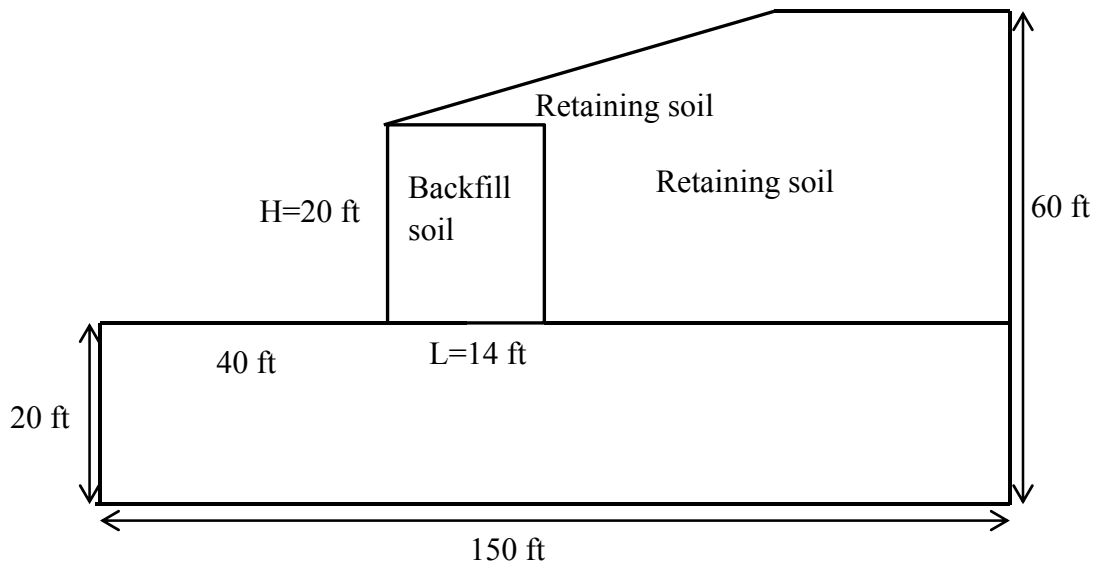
MSE Wall with 20 ft Wall and 3H:1V Back Slope.
